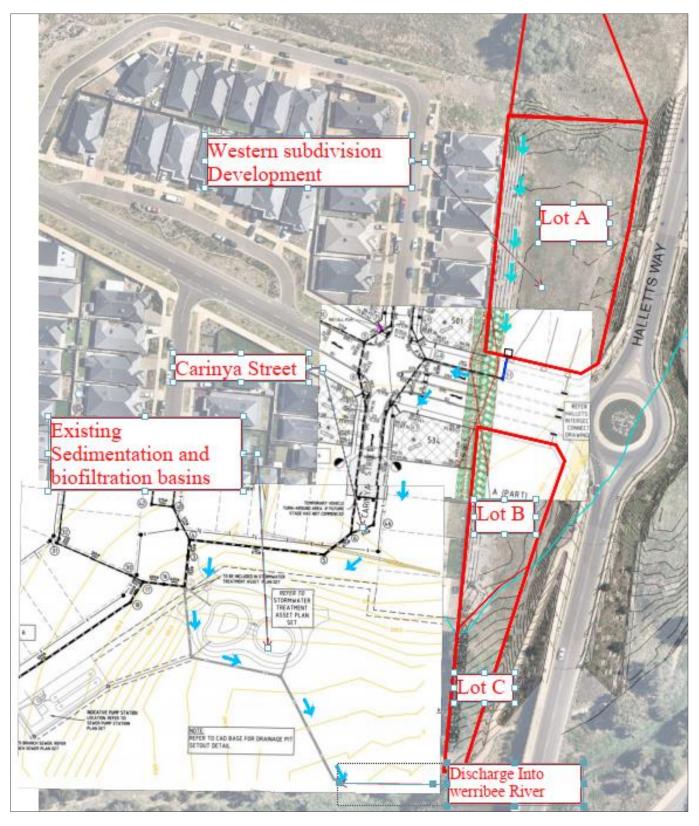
INDICATIVE CONCEPT DRAINAGE LAYOUT PLAN FOR HALLETS WAY WESTERN (LOT A) SUBAREA
